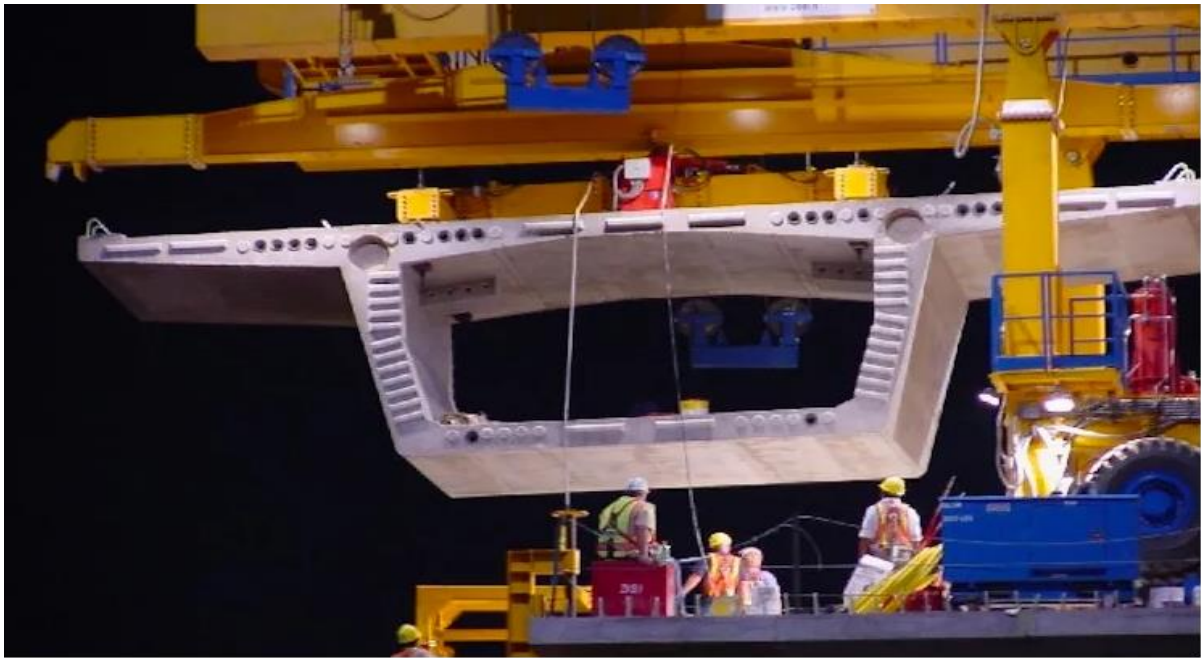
Construction of a Segmental Bridge on the ‘Dallas High Five Interchange’
